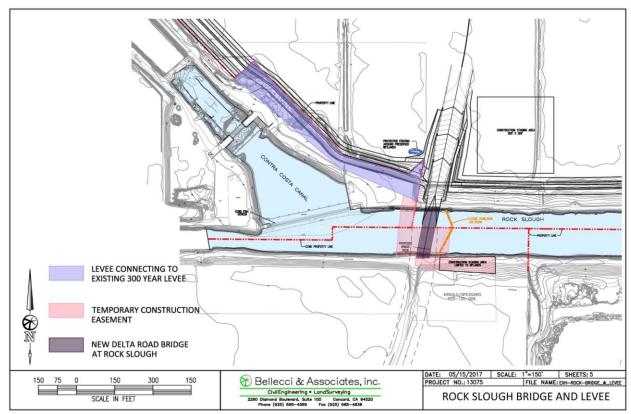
New Bridge and Levee Extension Next to Rock Slough
